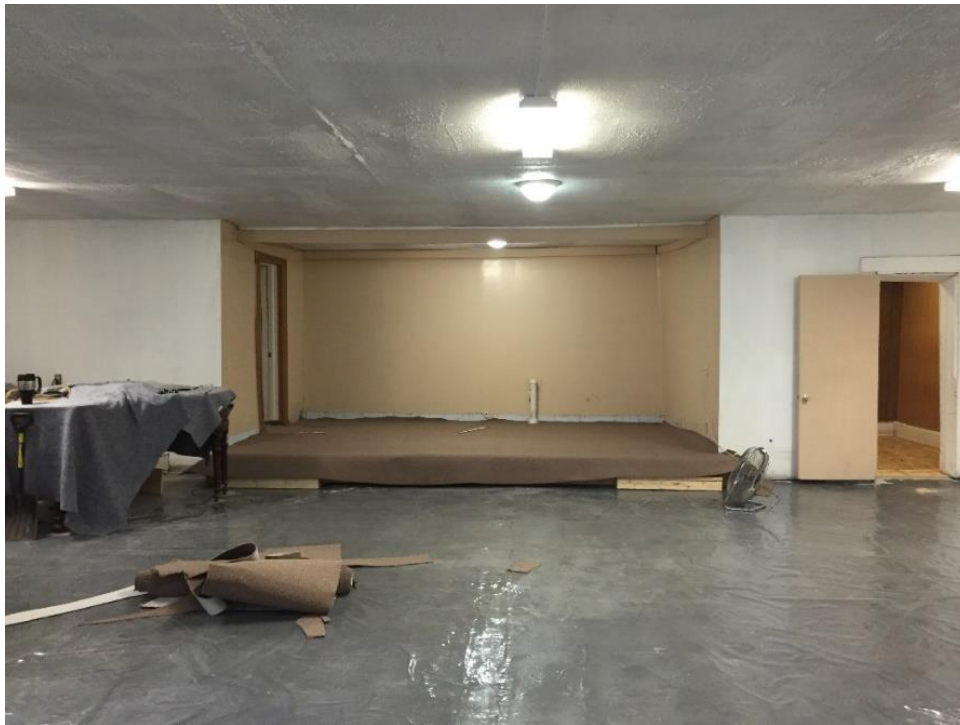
Vapor barrier being installed over deteriorated slab of building
